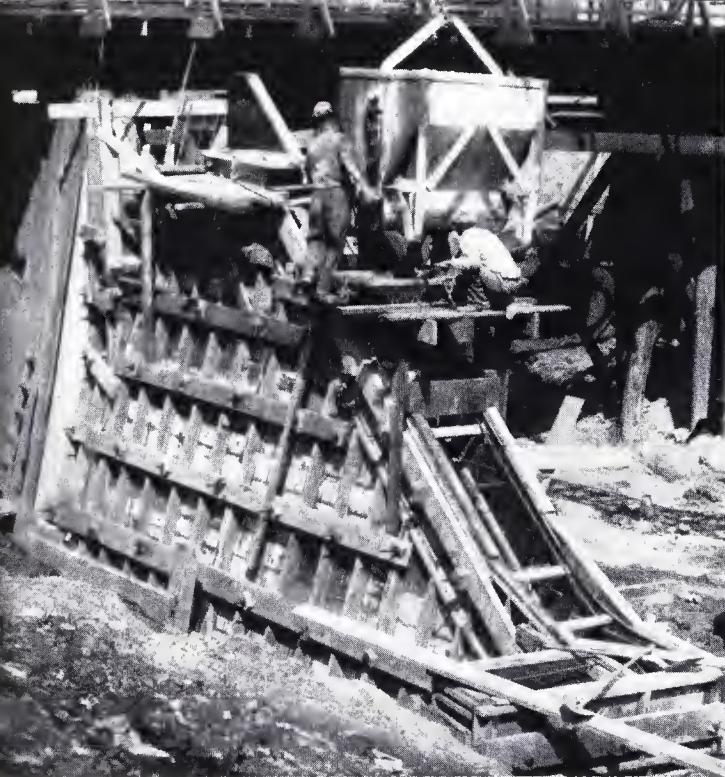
Placing concrete at several points in the sloping portion of wing walls avoids separation.
